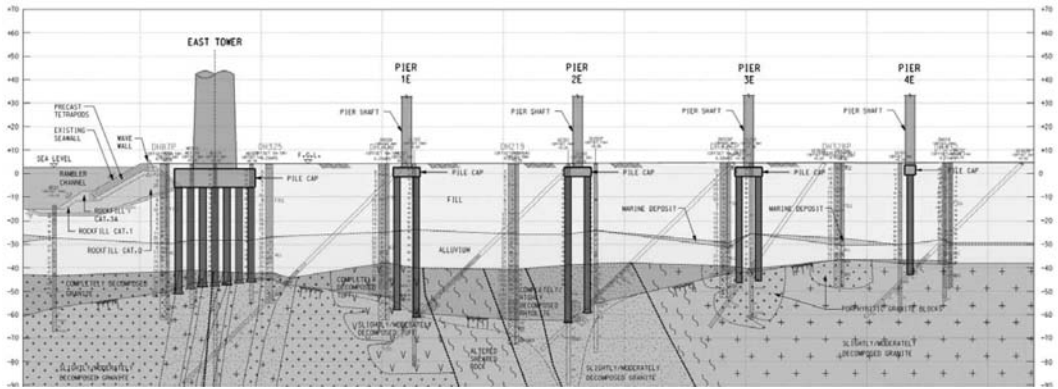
Section through the East Tower and Back Spans of Stonecutters Bridge, Hong Kong.
